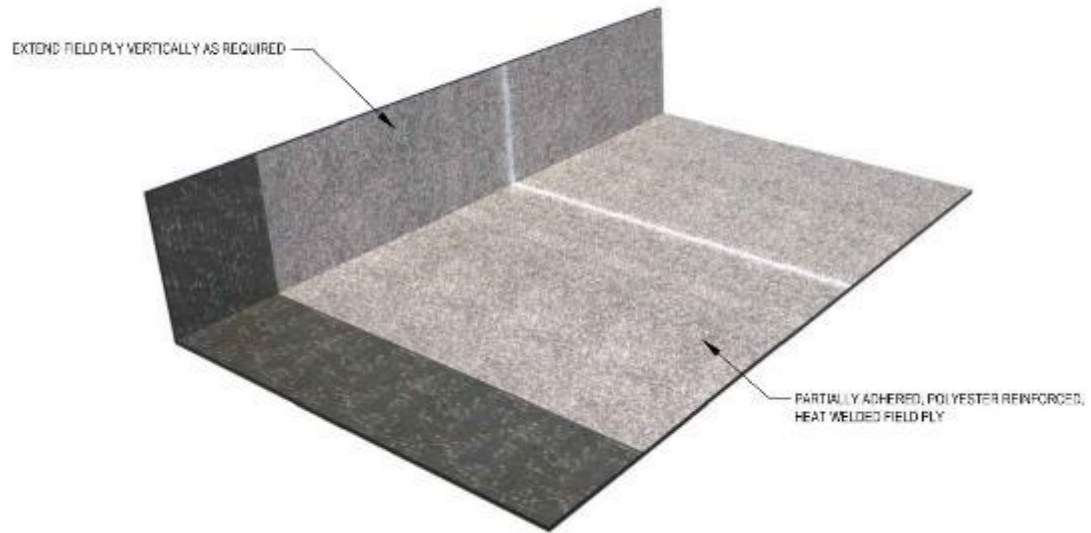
Partially Adhered, Heat Welded Vapor Retarder Termination at Wall/Curb Without Cant
